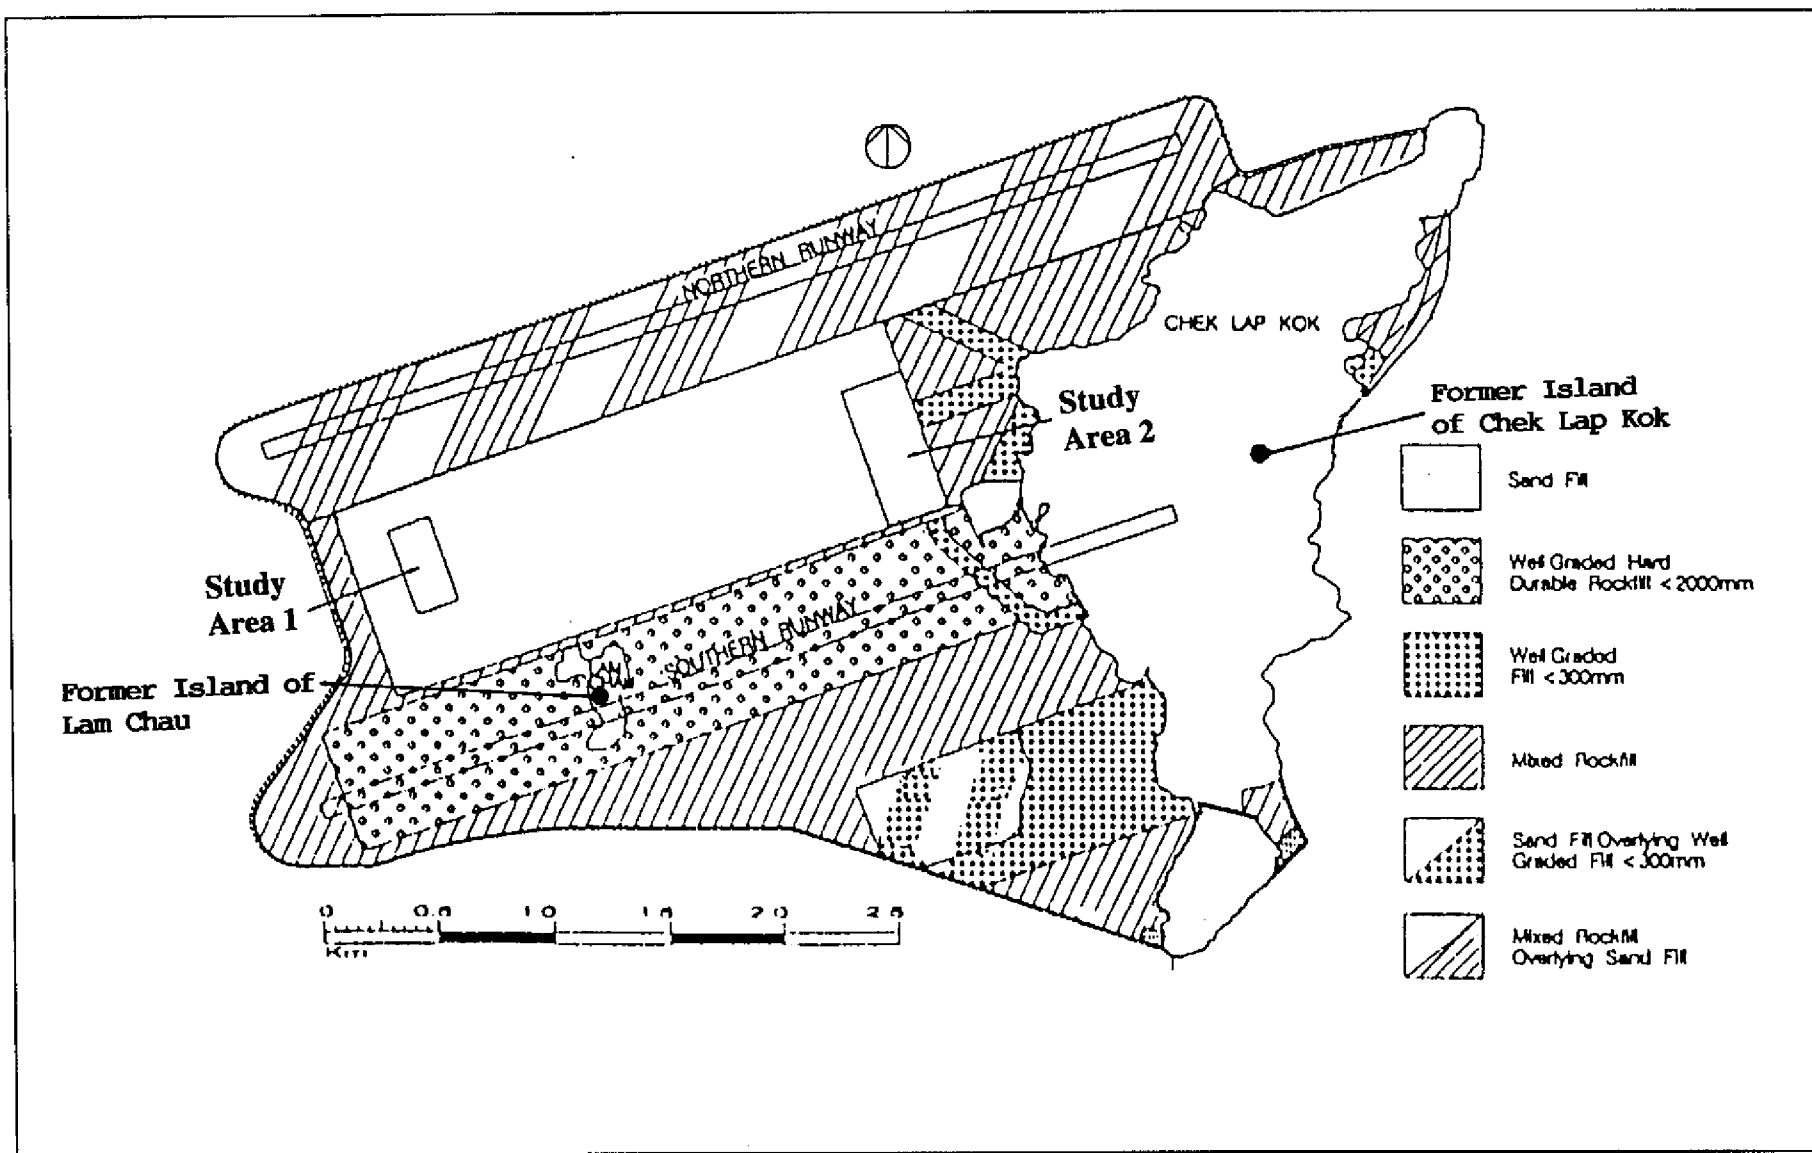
Plan of Reclamation at the CLK Site (after Newman et al, 1996)
